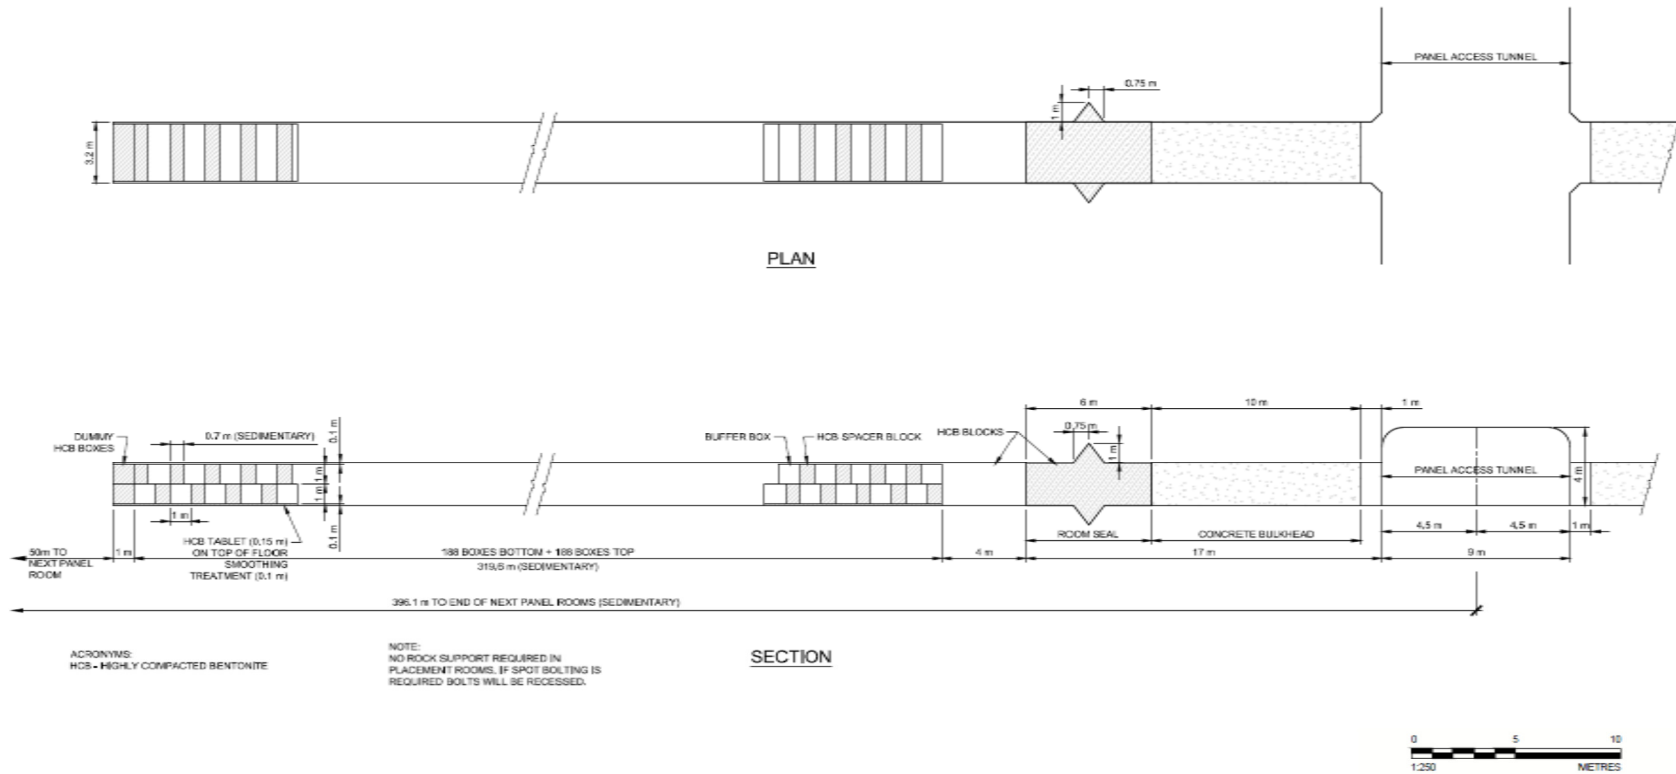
Plan View and Longitudinal Section of Placement Room
